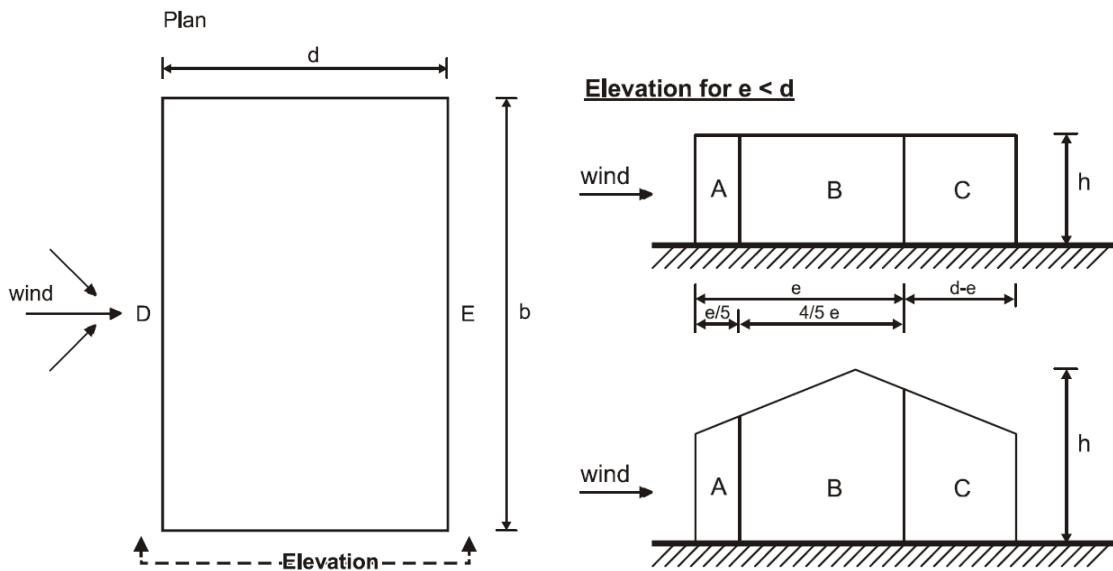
External pressure zones on a single building, taken from EC1 figure 7.5. Left shows the plan view of building, right shows the elevation view. Zone D is the windward face of the building, zone E is the leeward face, and zones A, B, C are on the sides parallel to the wind direction, with zone A being the zone nearest to the windward face. All zones except D have negative pressures, which means they are in suction.
